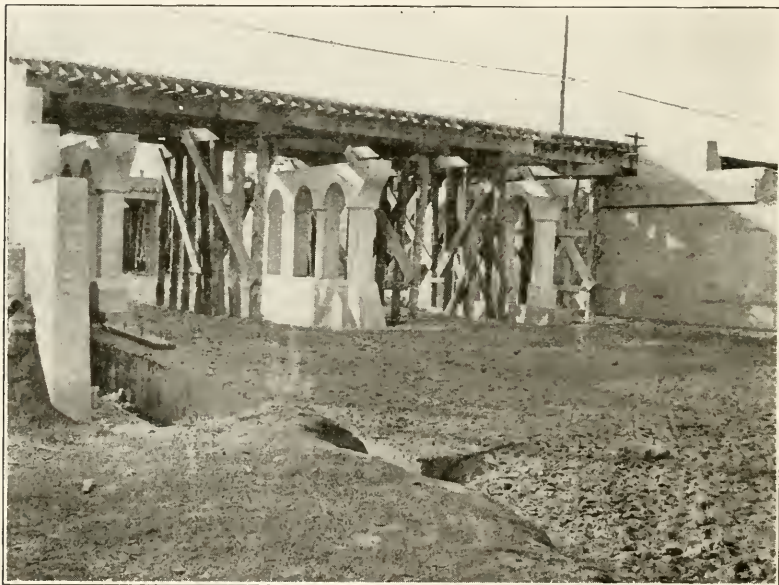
VIEW OF WASHINGTON STREET SUBWAY BRIDGE SHOWING PIERS AND FALSEWORK.
